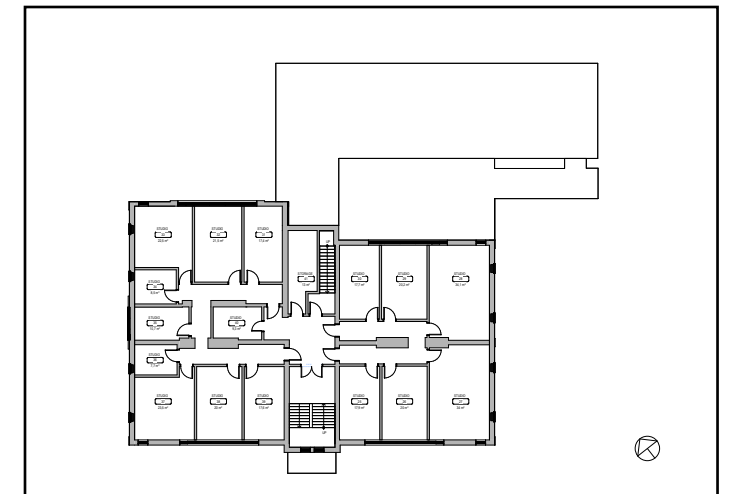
827 Gordon Street second floor plan. Prepared by EVOQ.
